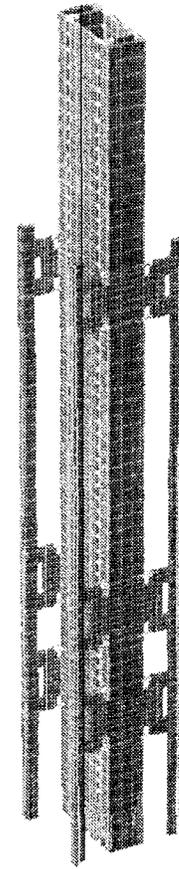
Isometric View of the Shearwall and Outrigger Lateral System
